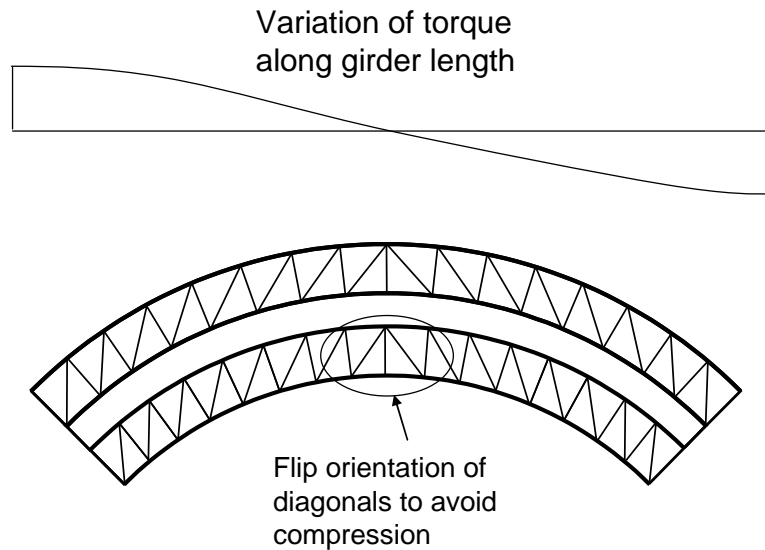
Diagonal Orientations in Pratt Truss Layout
